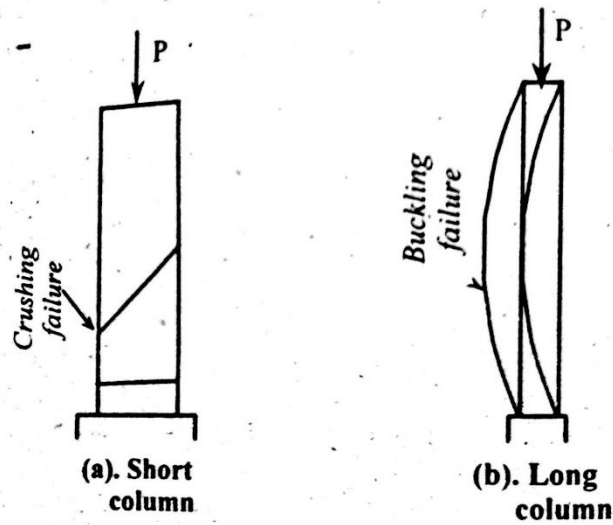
Short and long column failure (civiljungle.com)
